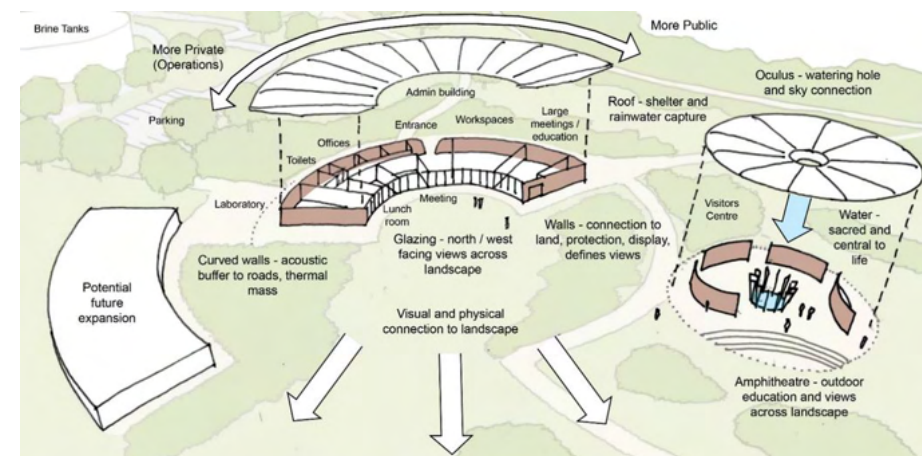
Early sketch showing architectural design concept for the Administration/Operations Building and Visitors Centre Pavilion
